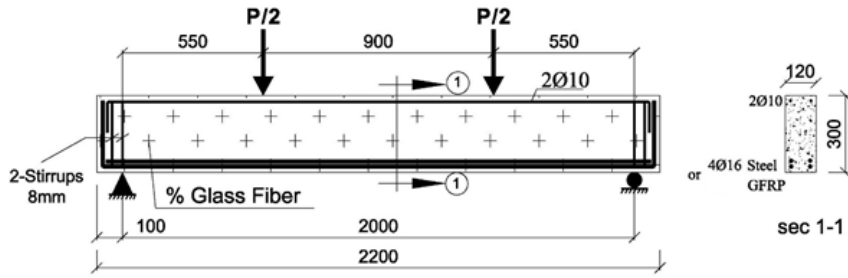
Longitudinal and cross-section detailing for GFRC beams
